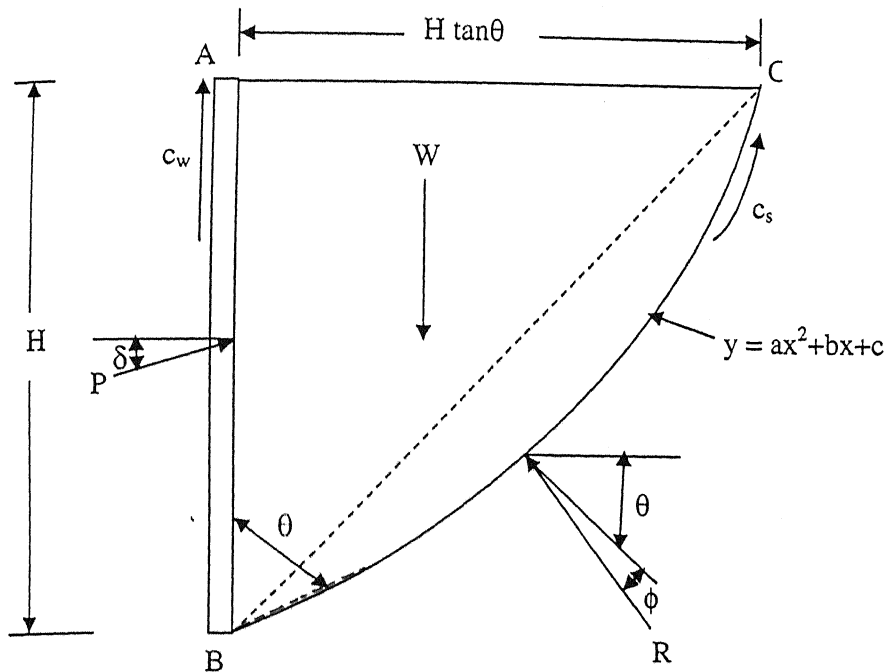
Forces acting on cantilever retaining wall (without loading, unreinforced backfill)
